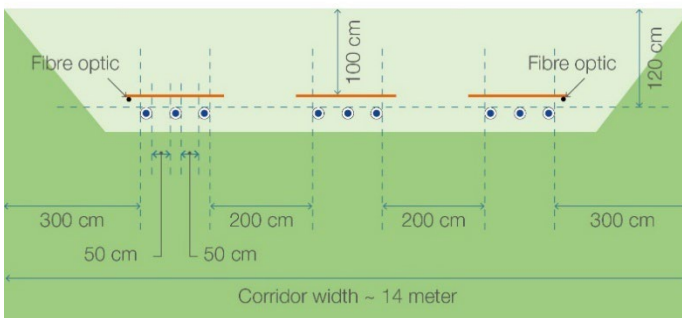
Cable trench configuration 380 kV HVAC connection IJmuiden Ver Beta and Gamma
